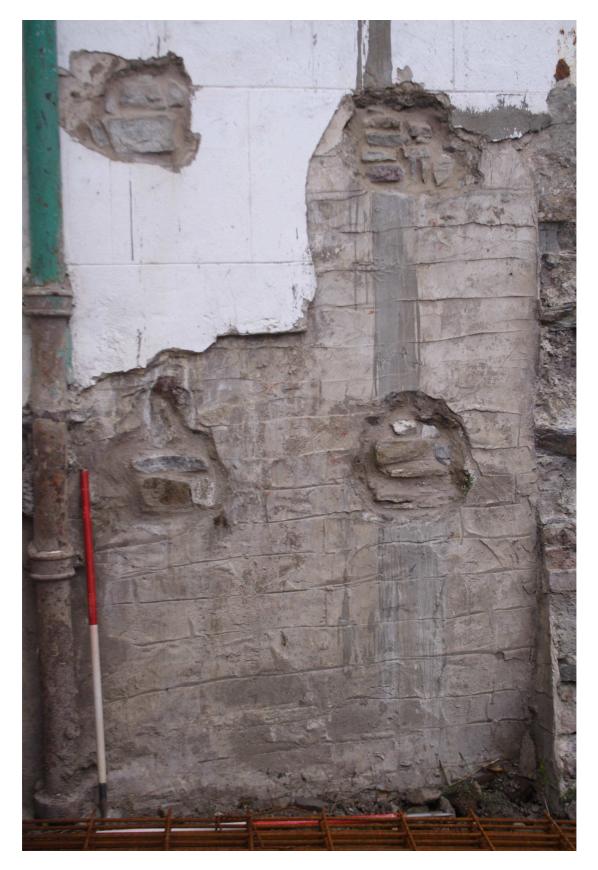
Lower section of southwest end of retaining wall showing concrete render and pinning scars, shot 11.
